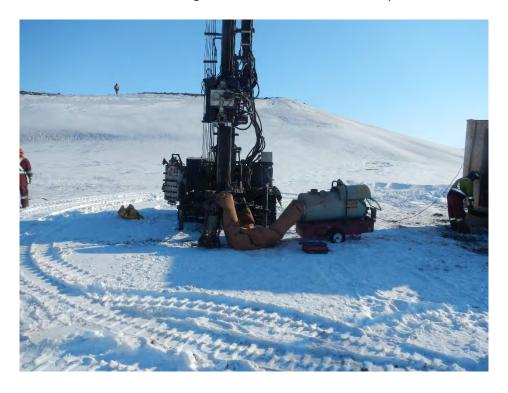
Drilling Conditions at BH18-BR102-1, April 2018
